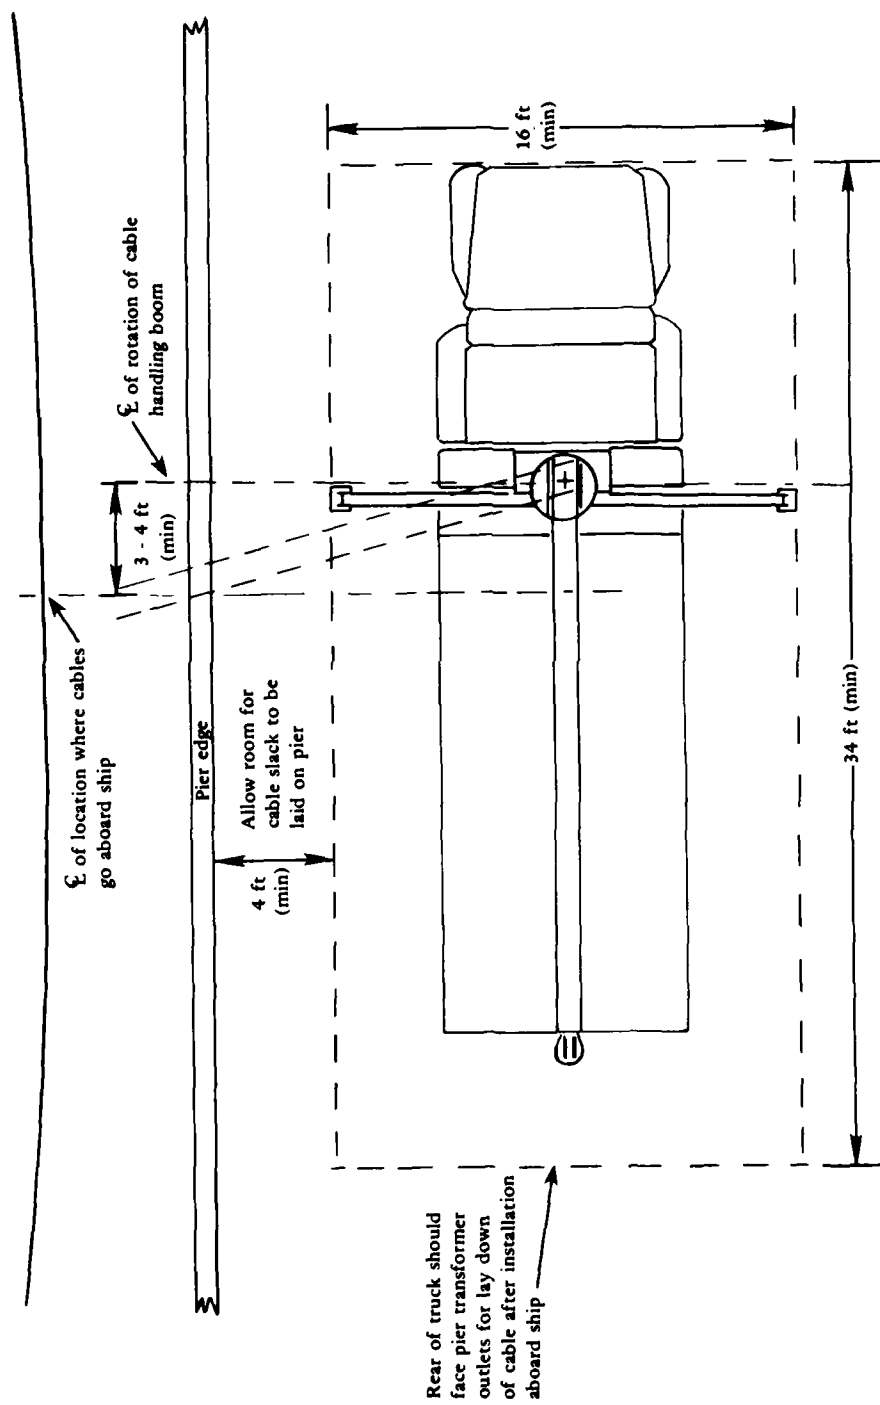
Cable handling boom truck pier space and site selection requirements.
